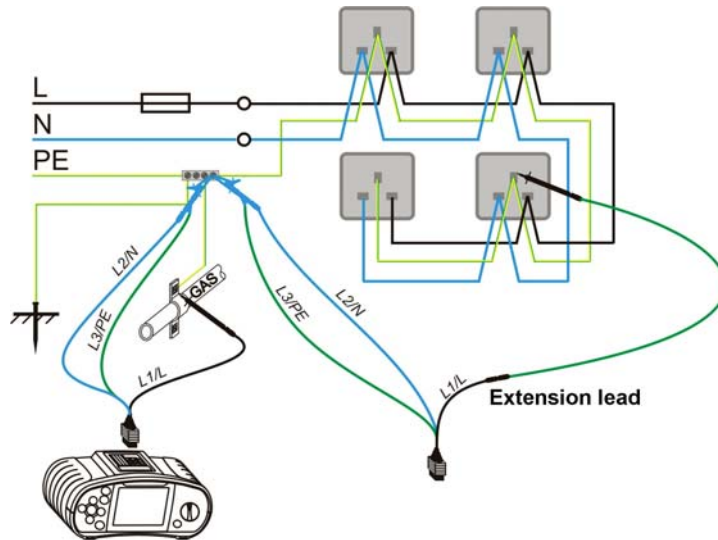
Connection for testing the R2 section of the wiring and bonding connections
